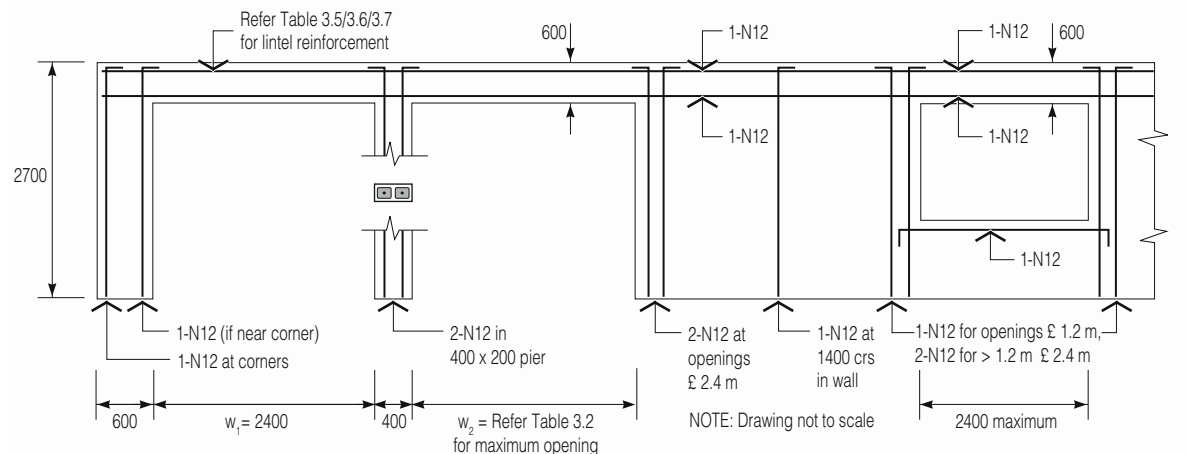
Wall Reinforcement for 190-mm Leaf for Wind Classifications N5 and C2 and 2700-mm Wall Height
